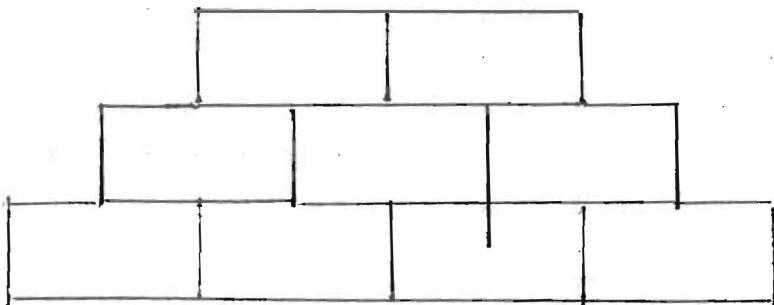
Draw Bottom Road Prism. Section to be Obliterated.
